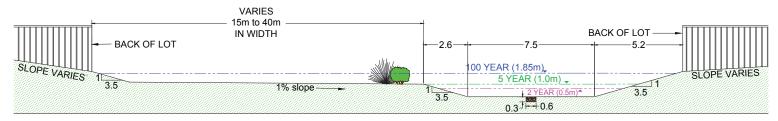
Typical Linear Park & Landscaped Drainage Parcel Cross Section
